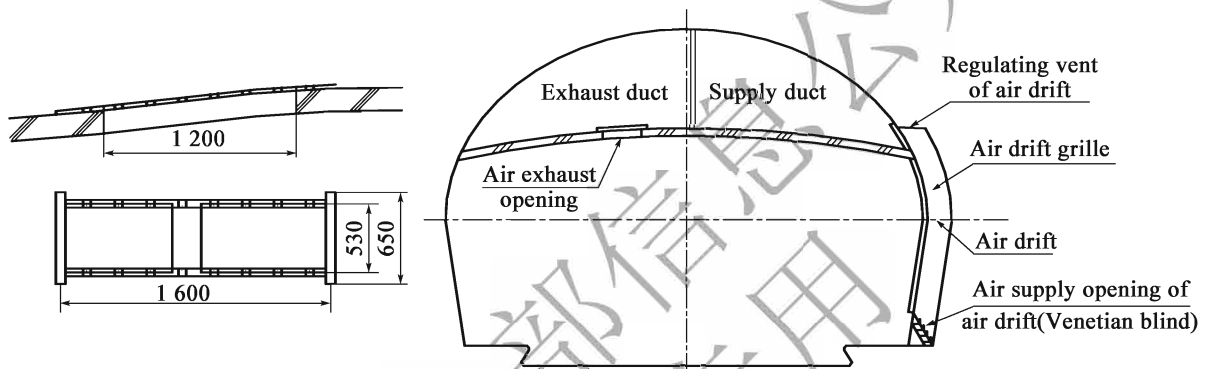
Example of locations of the air supply opening and air exhaust opening (unit: mm)
